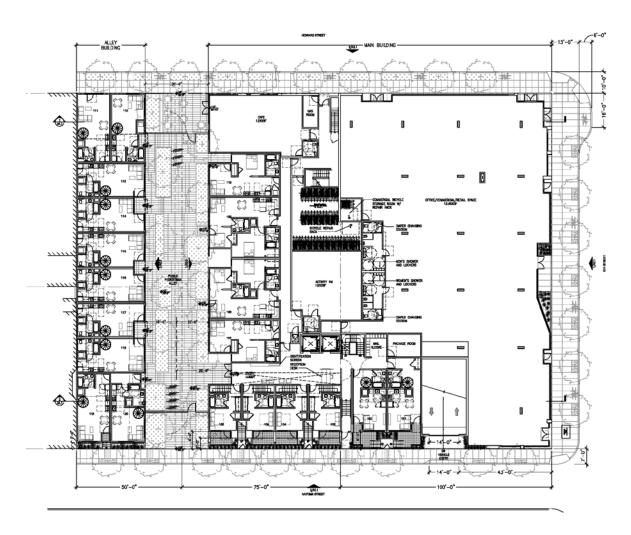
Floor Plan, Floor 1 (Natoma Street Driveway Option)
